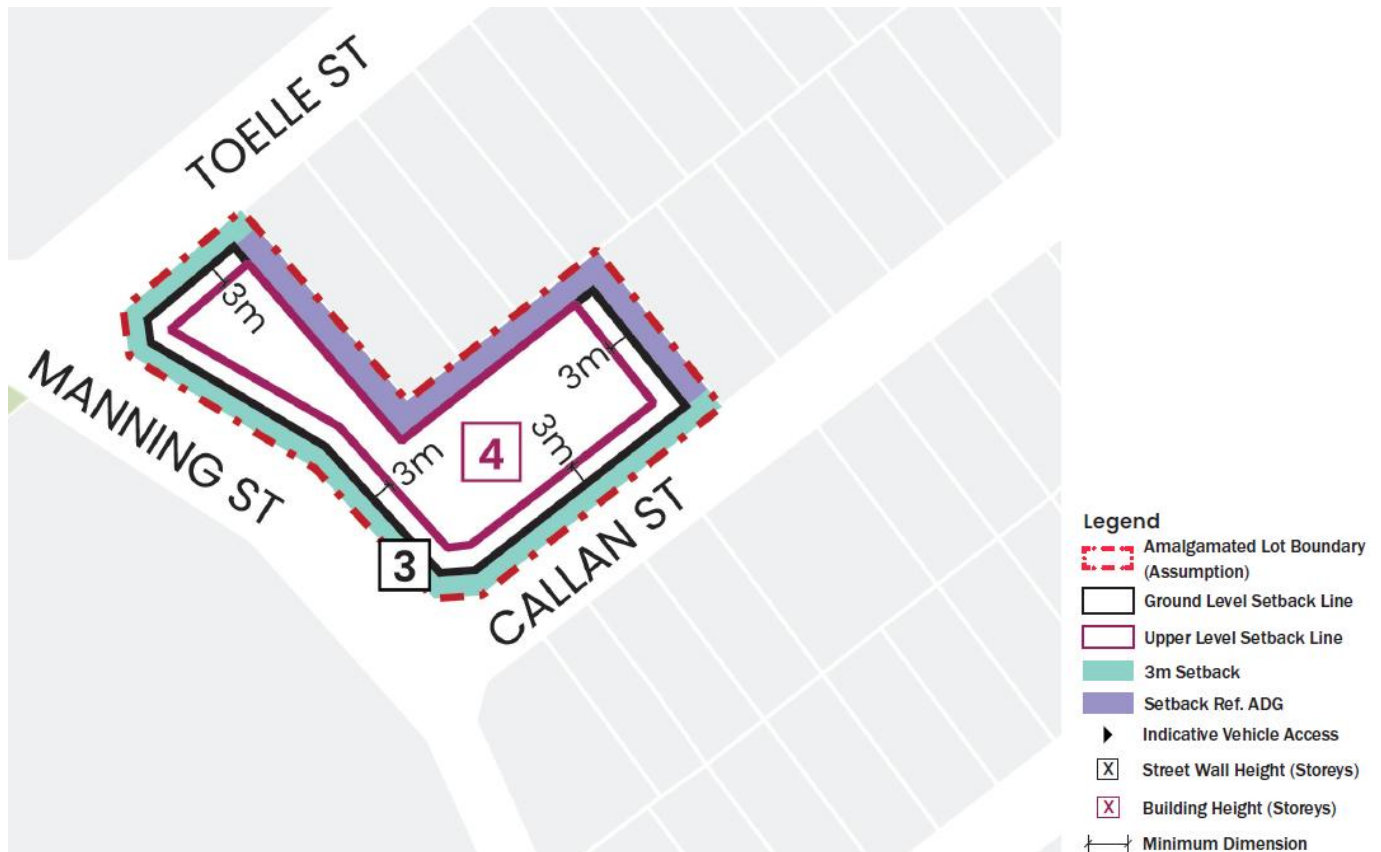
29-35 Callan Street and 30-32 Toelle Street - Indicative Layout and Design Principles
